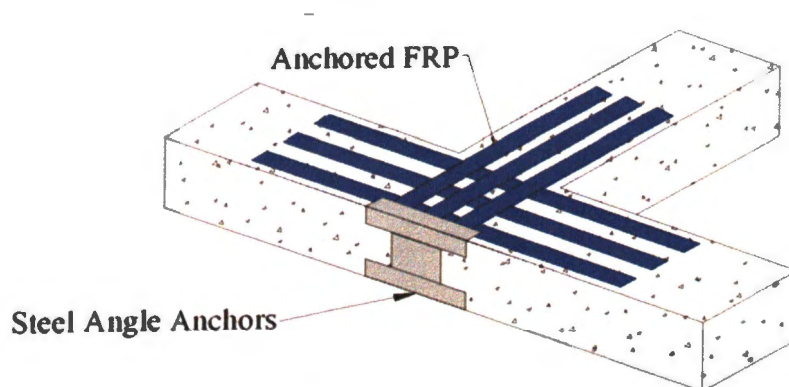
Steel Angle Anchorages Used in Antonopoulos and Triantafillou (2003)
